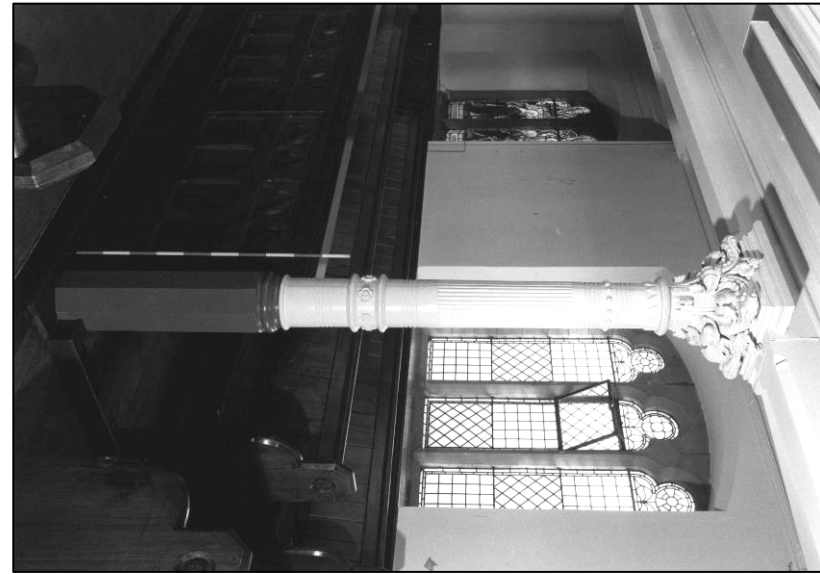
Church: GF, typical column to E aisle, looking NE (photo 2/9) (top to right).
